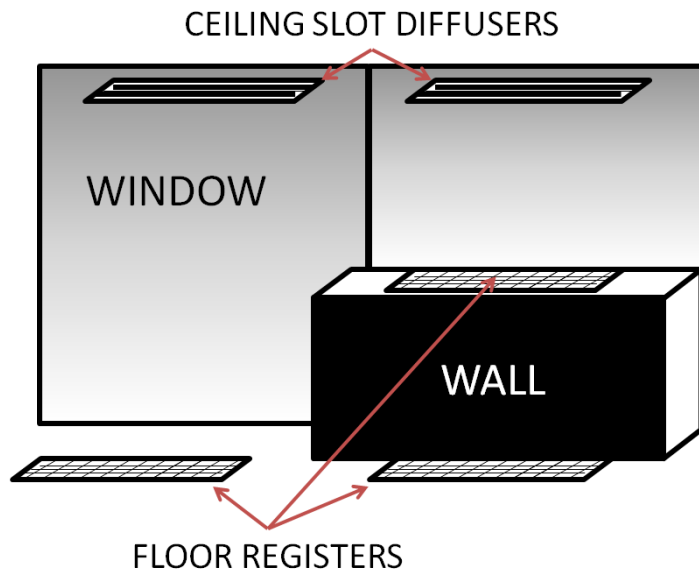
Depiction of diffuser layout in modern buildings with floor-to-ceiling glass windows
